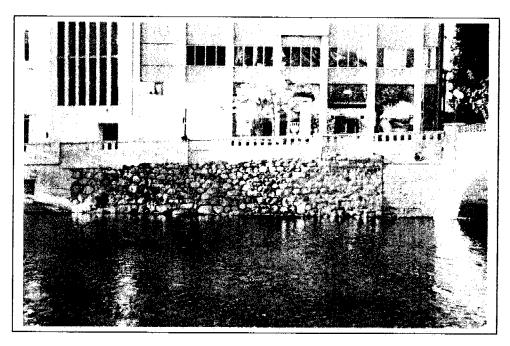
Section L. south bank, east of Rainbow Street, camera facing east, 2/7/02.
